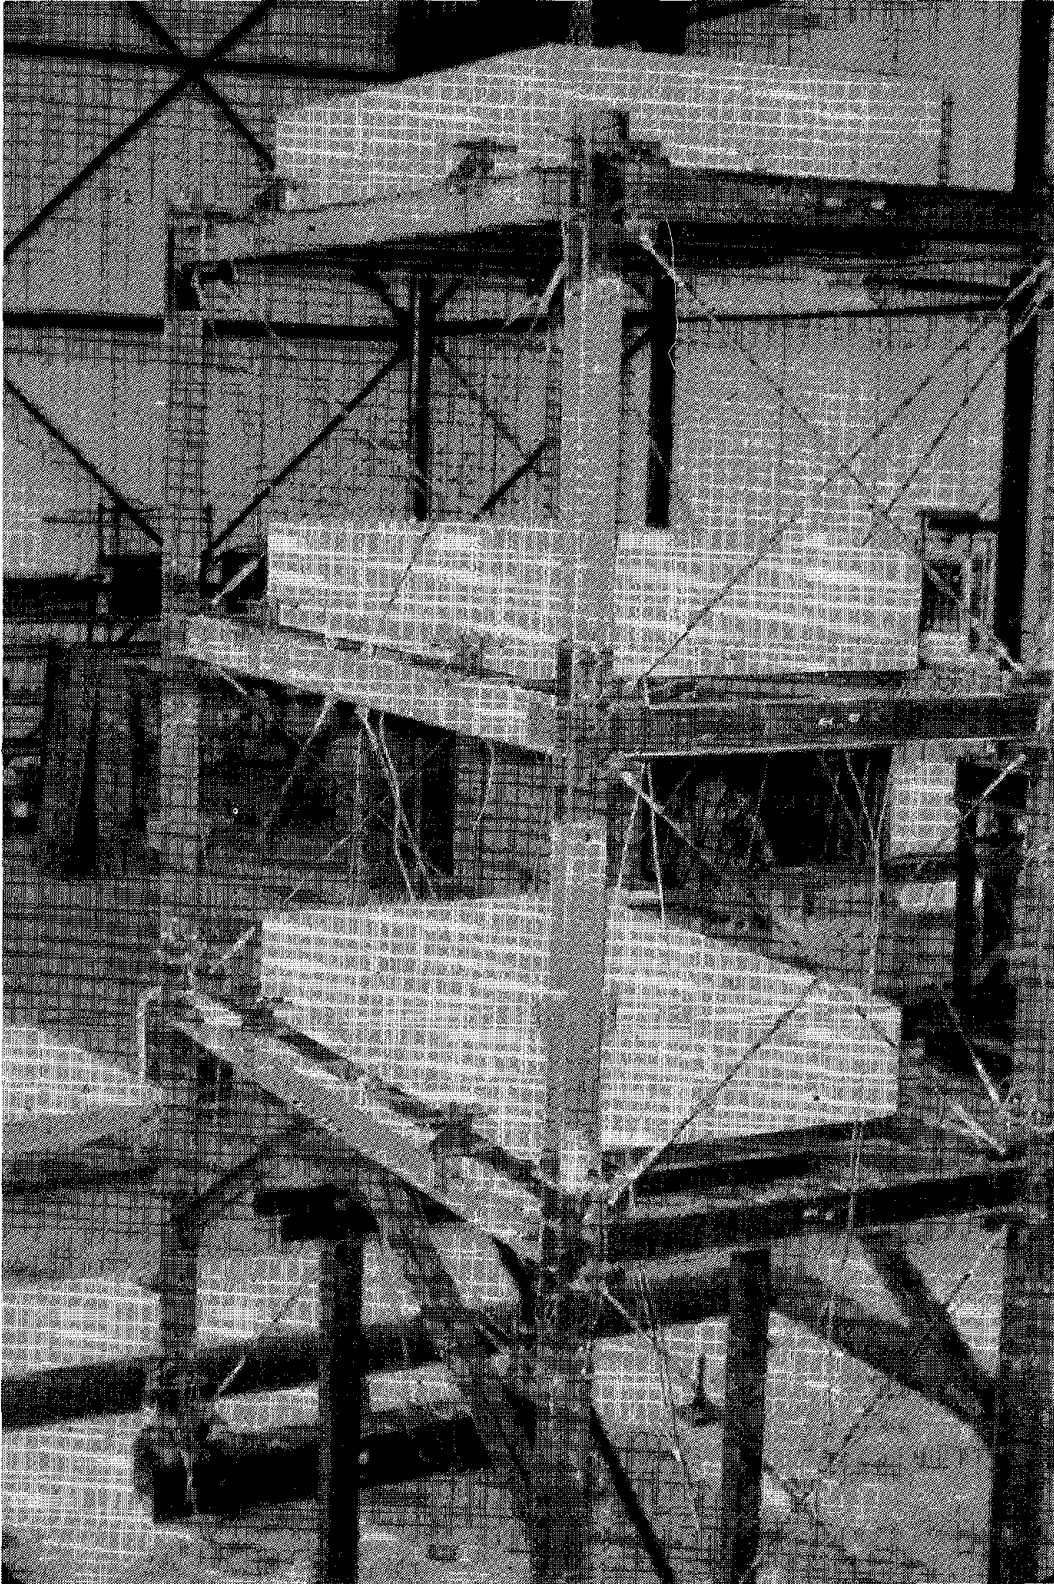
Test Structure with Rod Braces on the Shaking Table
